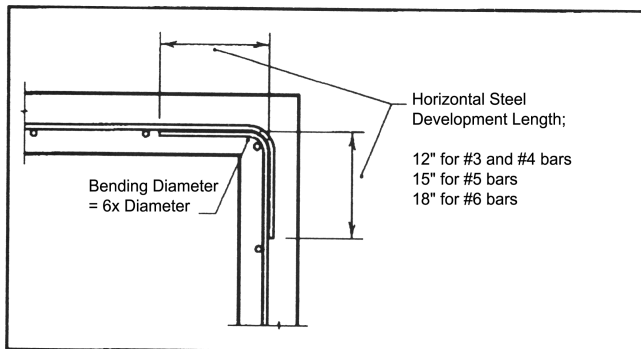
Secondary containment floor structural design. See Table 5 for thickness and steel reinforcement requirements.
